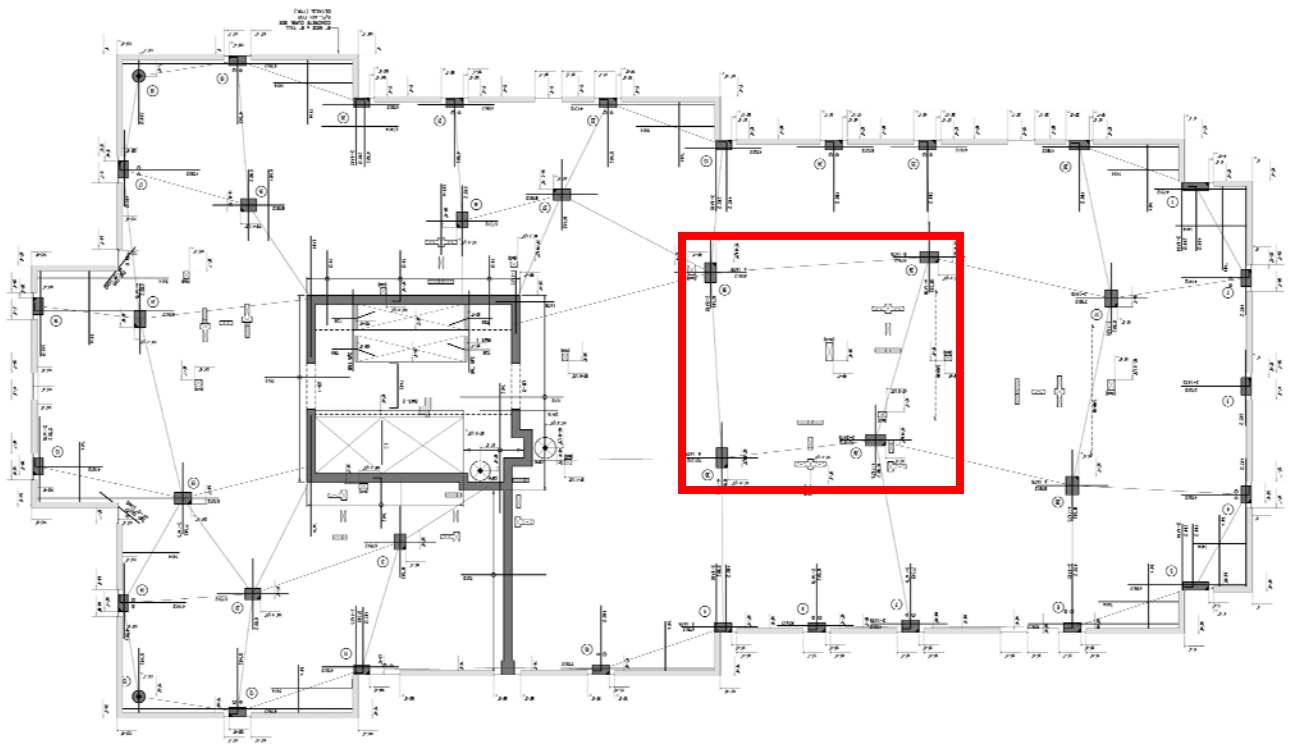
Floor plan of Southtown Building No. 5. Red box indicates interior bay used for analysis of existing two-way reinforced concrete flat plate floor system
